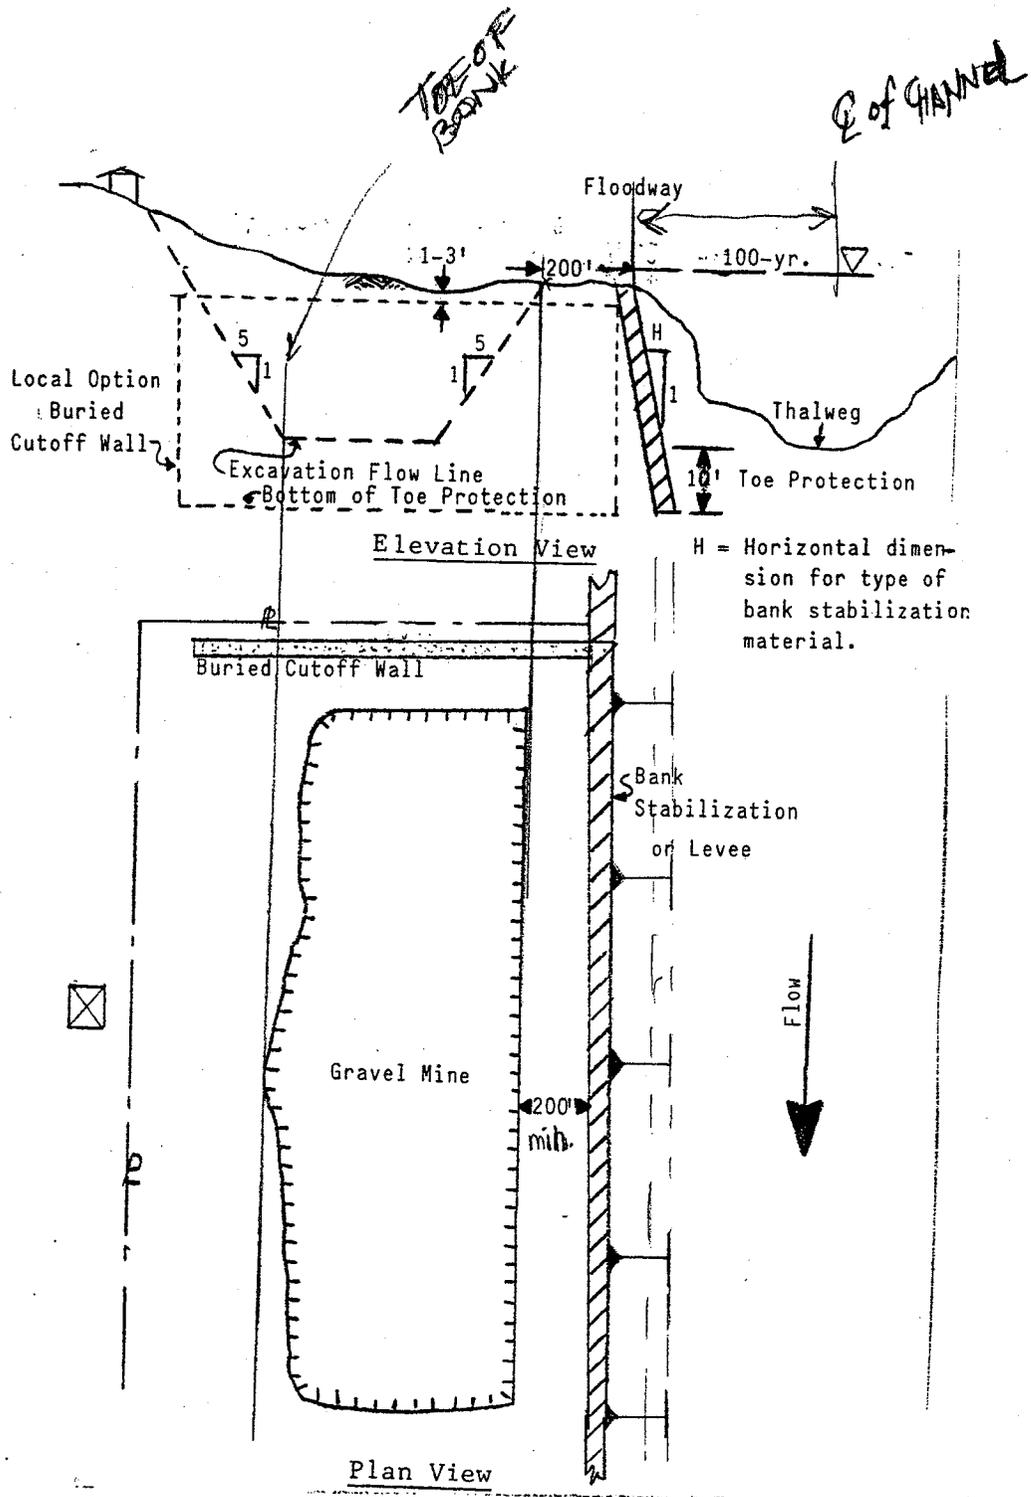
Overbank Gravel Mining in Reaches with Bank Stabilization.
